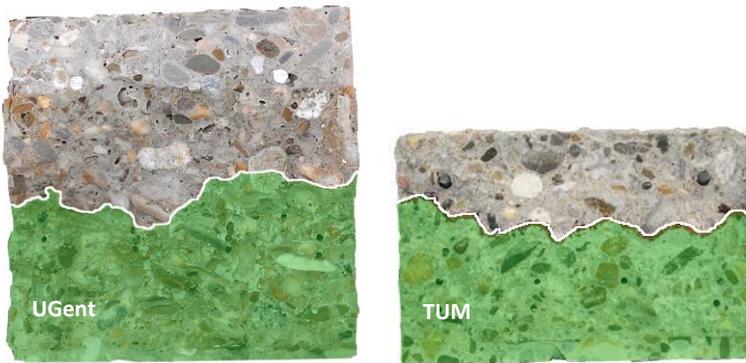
split cracked plane of a concrete specimen, where healed areas are highlighted in green.
